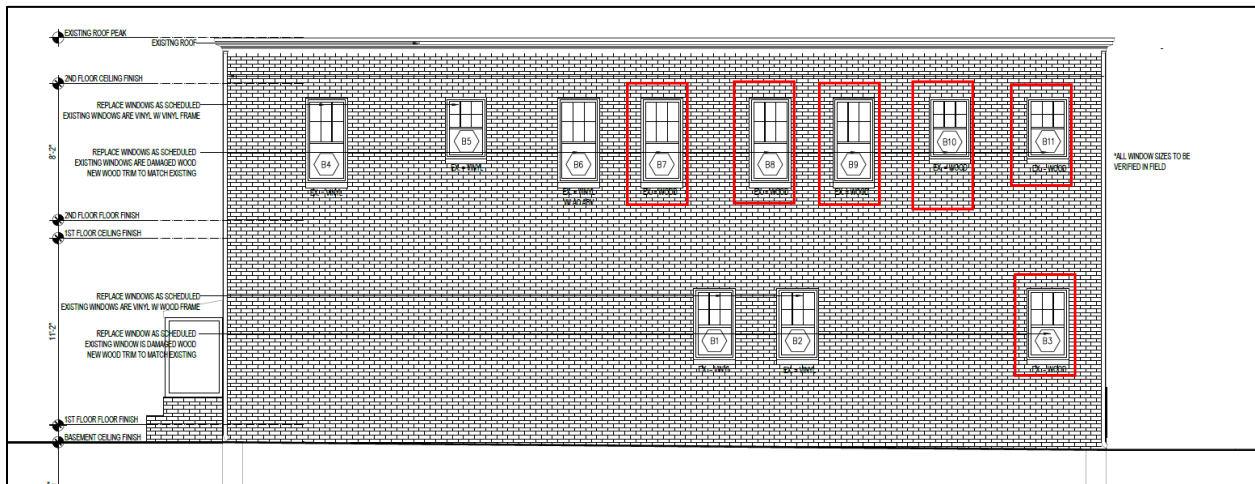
North elevation of subject property (Applicant, 2025). The existing wood windows are annotated with red boxes.
